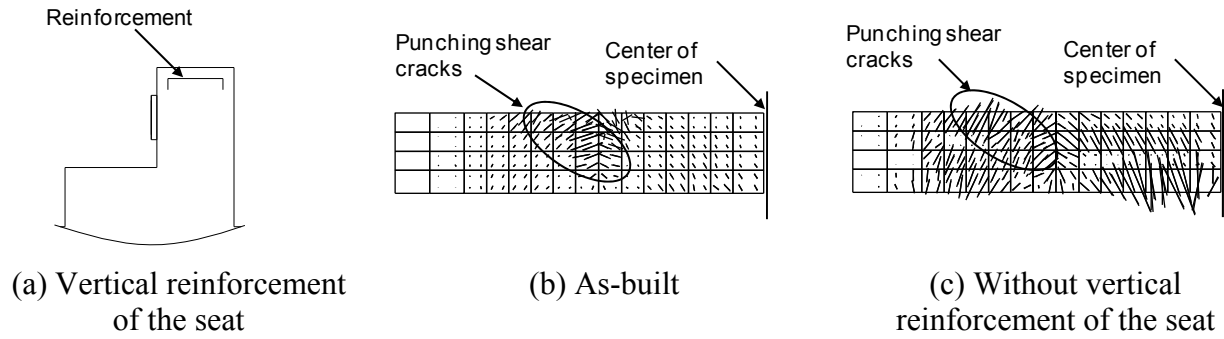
Predicted cracking for specimen S4 with (as-built) and without vertical reinforcement of seat (in original bridge orientation).
